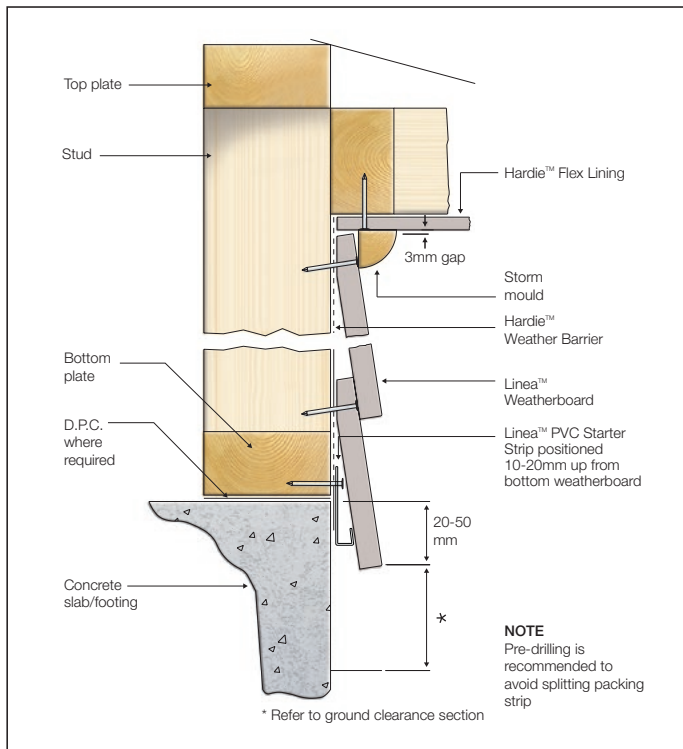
SLAB/EAVE JUNCTION DETAIL
